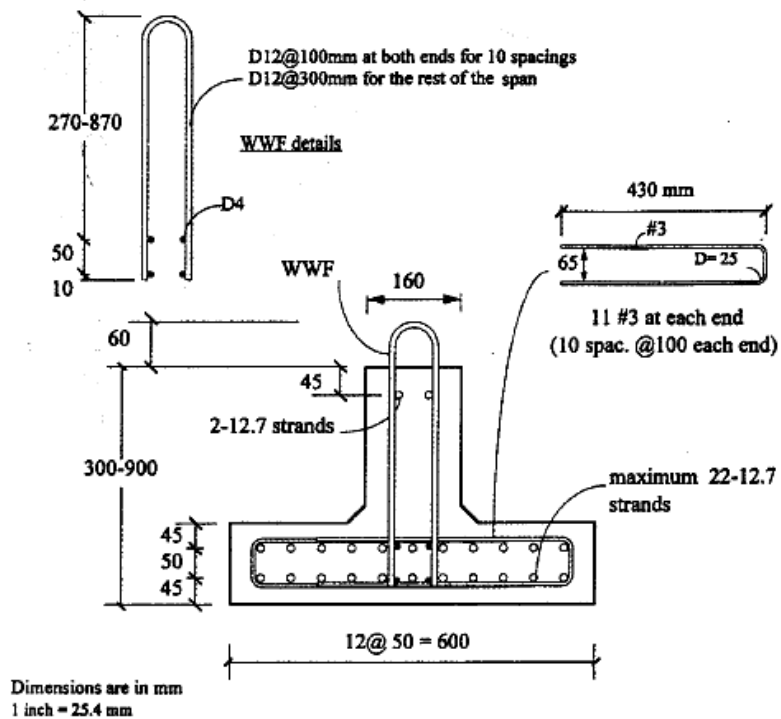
Cross section and reinforcement details for a tee beam used in the IT System (Kamel and Tadros, 1996)
